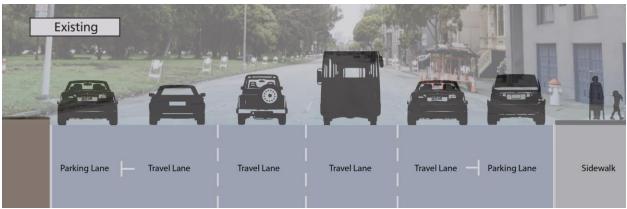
Existing Oak Street cross-section (typical between Shrader Street and Baker Street)
